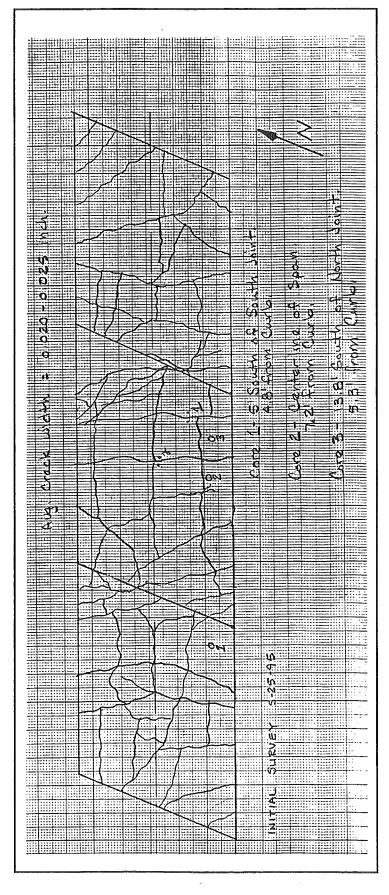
Crack Survey of Bridge Deck Spring 1995 Inspection.
